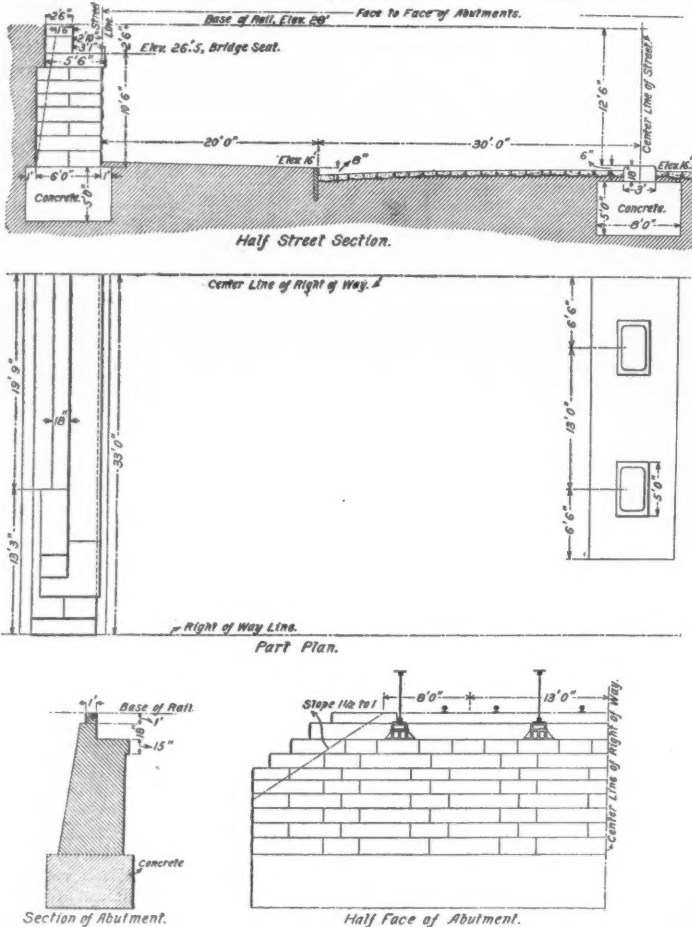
Masonry at Irving Park Boulevard—C. & N. W. Track Elevation.
